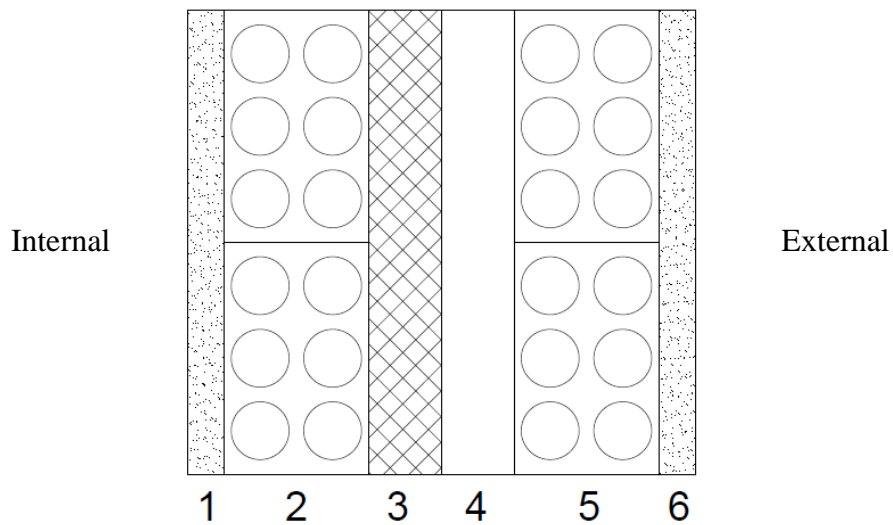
Typical topology detail of a double wall with insulation in-between with air gap
